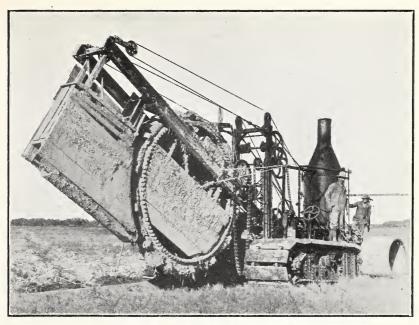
Steam Trenching Machine Equipped for Soft Land, Roswell, N. Mex.
